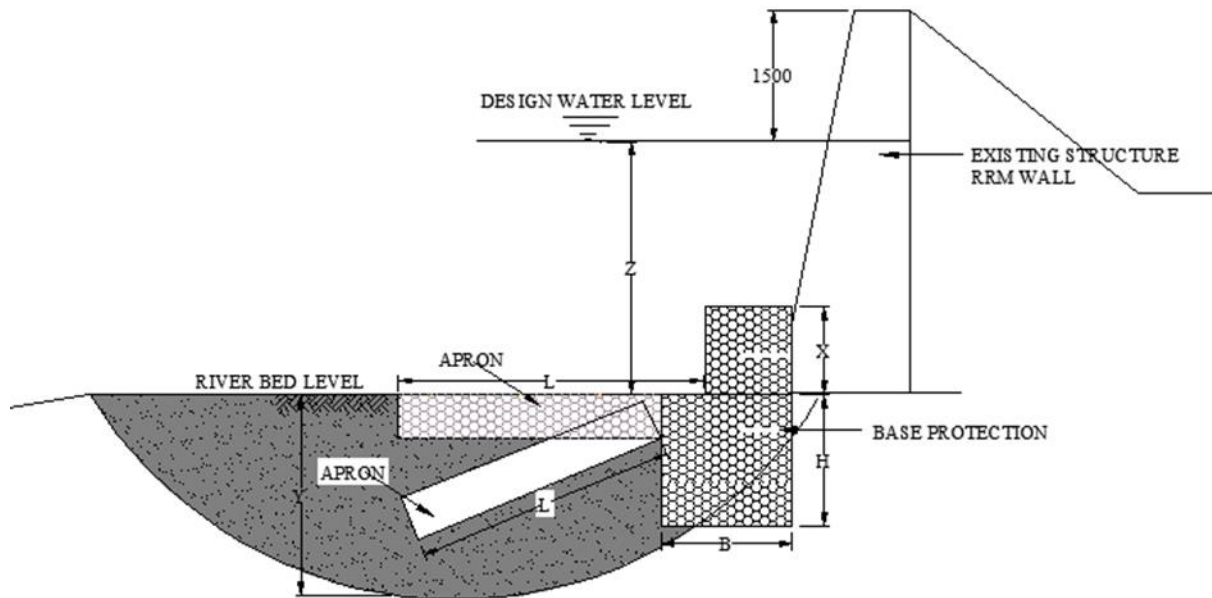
and Figure 6 show an interim measure to re-strengthen the existing revetment, reinforced cement concrete (RCC) wall and Random Rubble Masonry (RRM) wall for flood protection. The diagram shows that three elements (first gabion panel, second gabion panel and apron) will be constructed in front of the existing walls. The function of the first panel gabion box (height X) provided in front of the toe wall is to prevent the revetment/RCC wall/RRM wall from sliding and it will also provide better stability. Further, the second panel placed below the first panel will make foundation stronger and it will also protect against erosion. The apron provided will be launched in due course of time due to scouring. However, the
